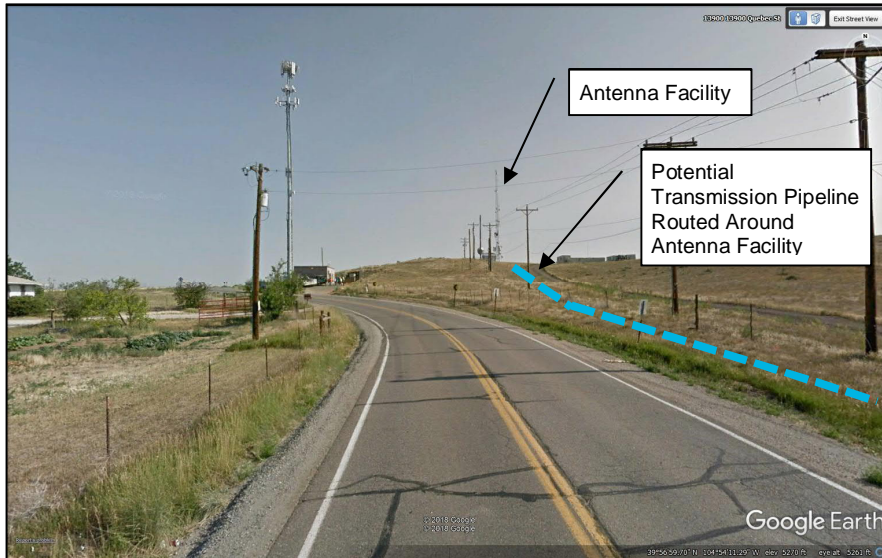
Just North of East 136th Avenue Traveling on Quebec Street Looking North at Antenna Facility
